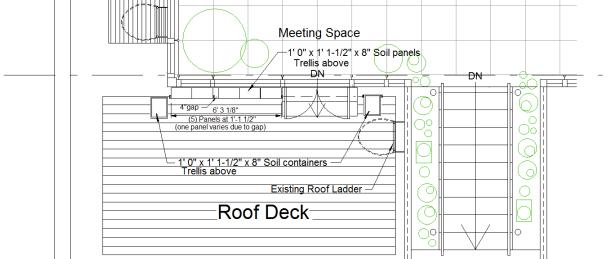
South Façade Research Bay Floor Plan, Leininger, 2012
